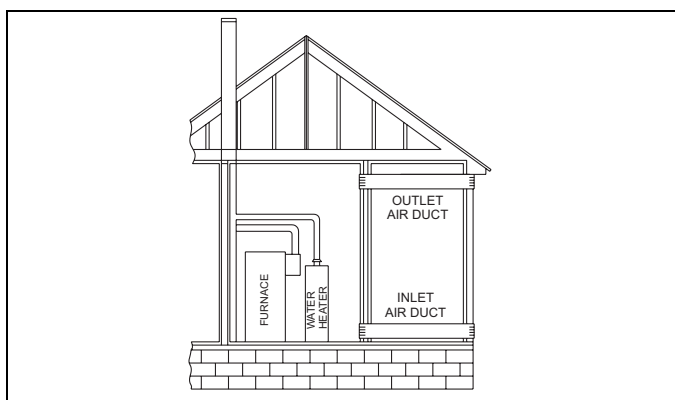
Horizontal Air Inlet, Outlet and Chimney Connections
